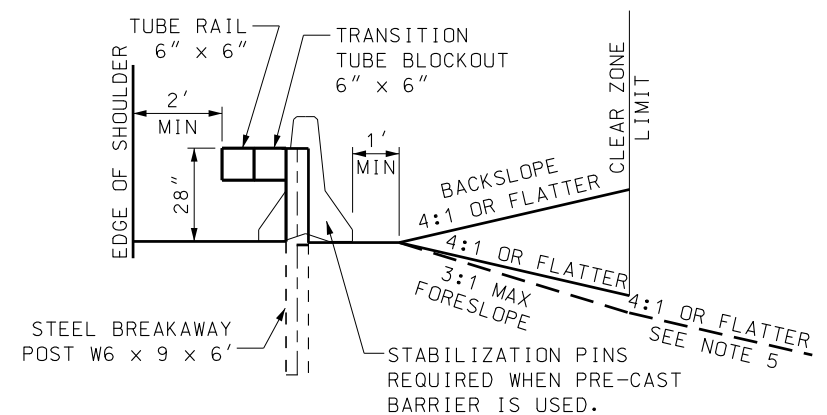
DETAIL WHEN SYSTEM IS INSTALLED WITH NEW JERSEY SHAPED BARRIER
